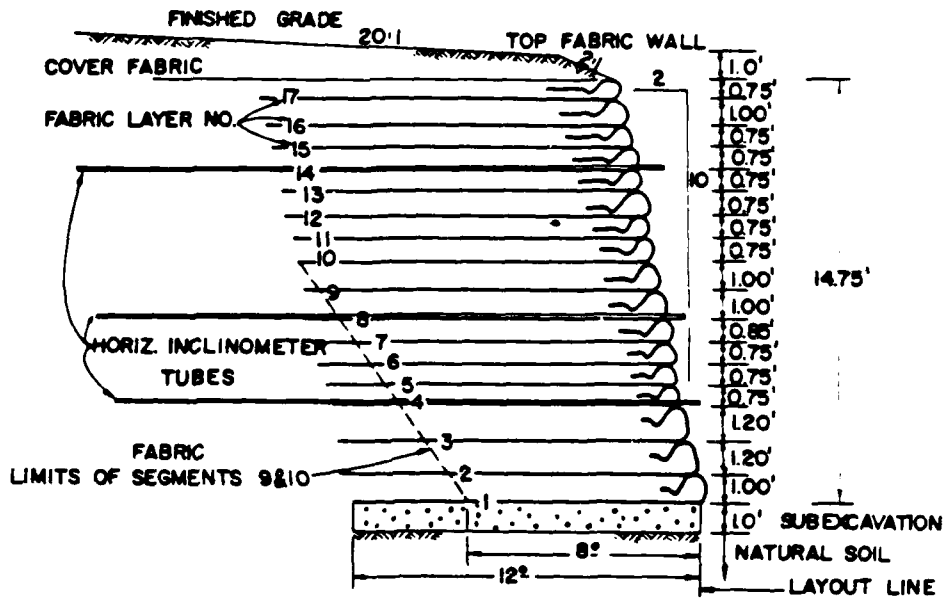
Glenwood canyon geotextile wall section, Colorado (Bell et al (1983))
